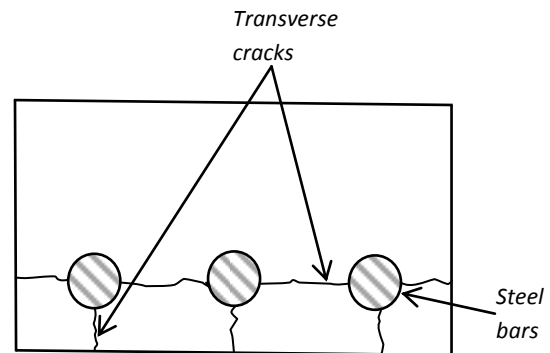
Splitting failure in reinforced concrete.
